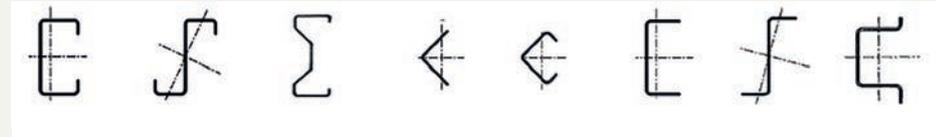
Typical CFS profile members used extensively in engineering applications
